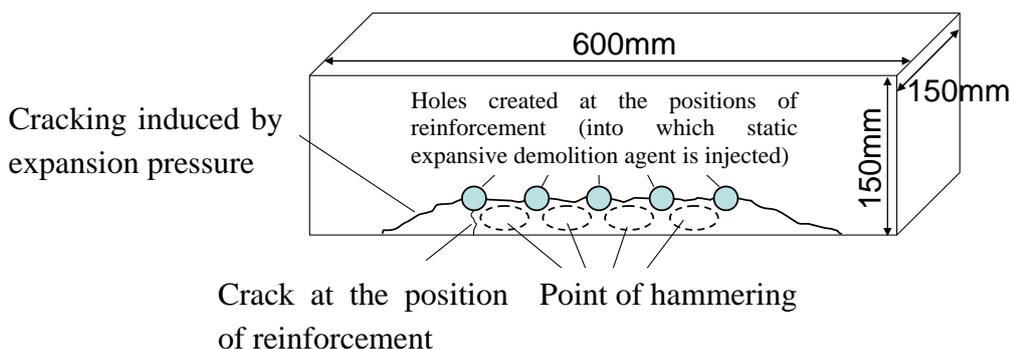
Test for verifying the effectiveness for preventing concrete spalling
